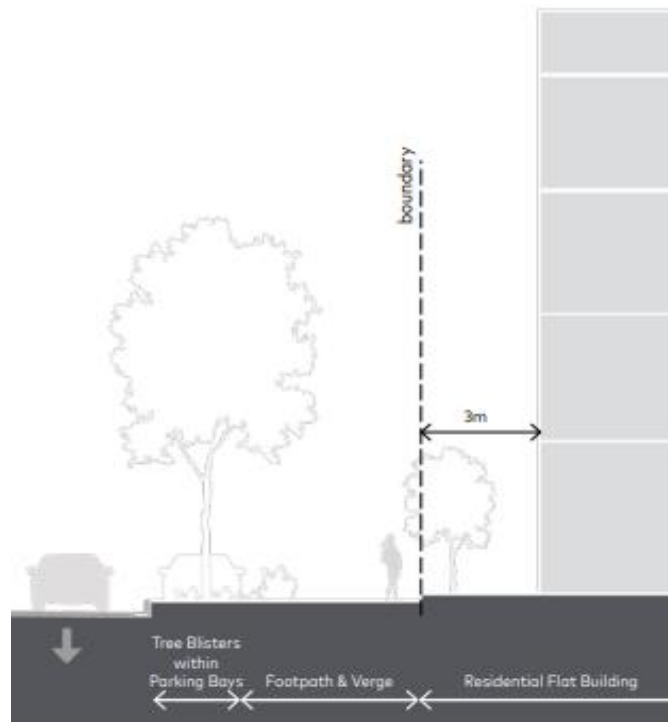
Main Street Section – Residential Flat Building Interface
